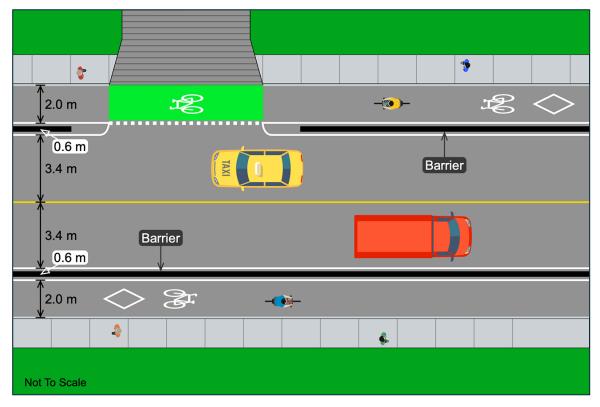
Wallace Street protected bicycle lanes, typical cross-section Fitzwilliam–Franklyn
